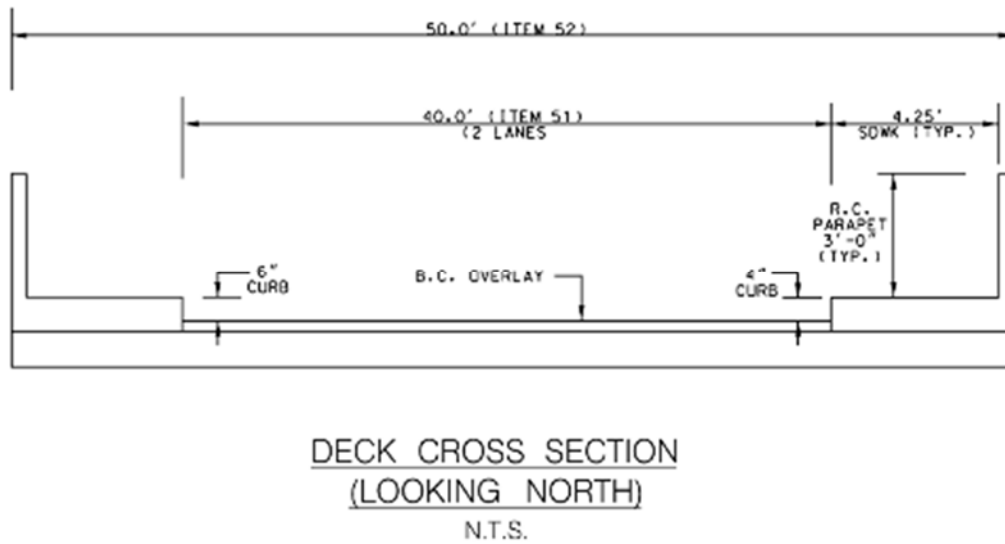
Structure 0118150 – Cross Section Sketch from Inspection Report
